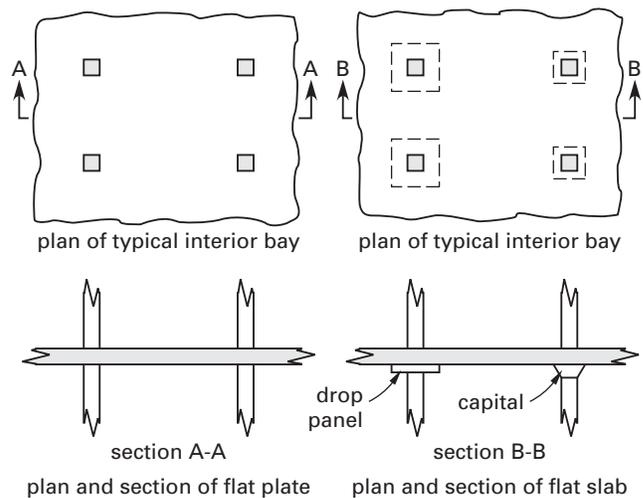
Representative Two-Way Reinforced Concrete Floor Systems
